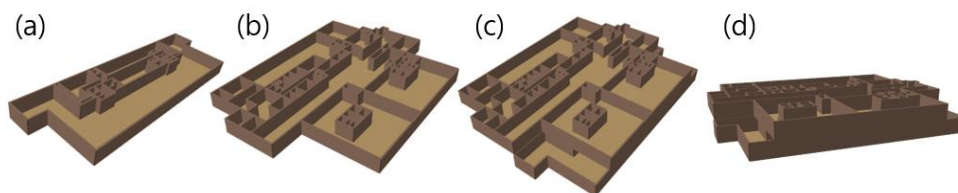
Floor alignment with SNU data; (a) B1 floor (b) 1st floor (c), (d) aligned floors
